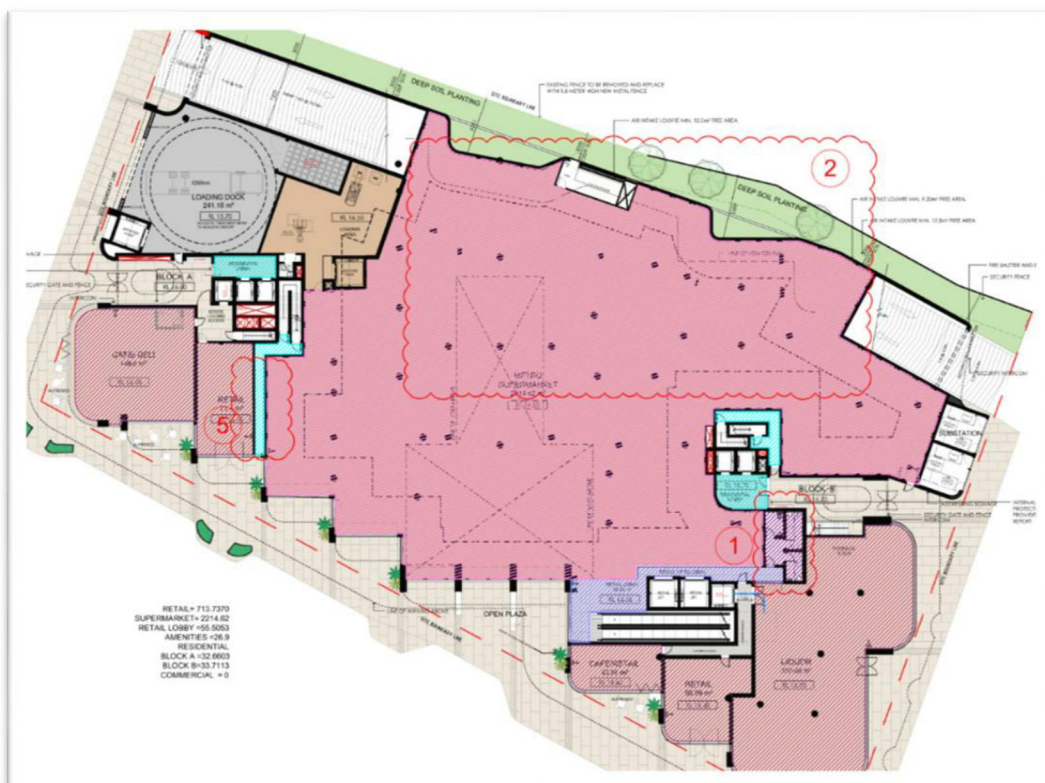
Modified Ground Floor Plan and area included from GFA calculation
